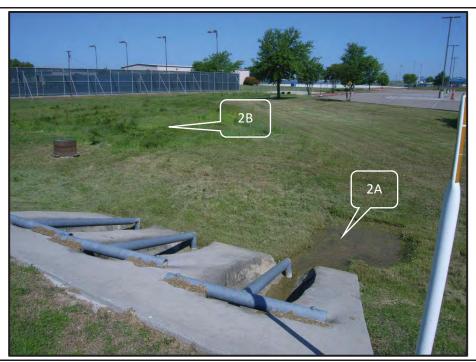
View looking north toward Crossing 1 – Jordan Creek (intermittent stream).
